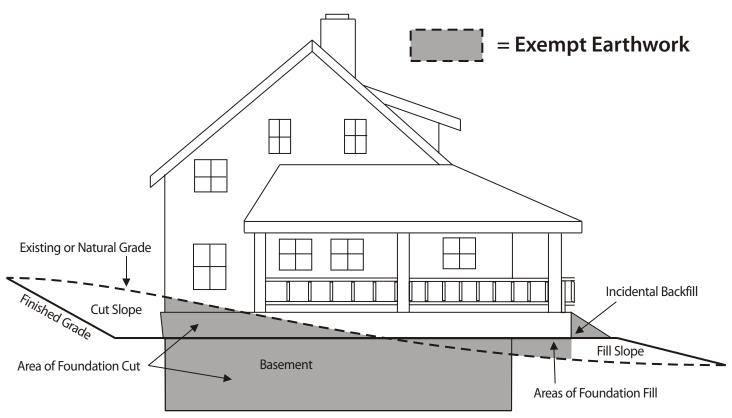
The diagram above illustrates which portions of a typical building pad are exempt.
